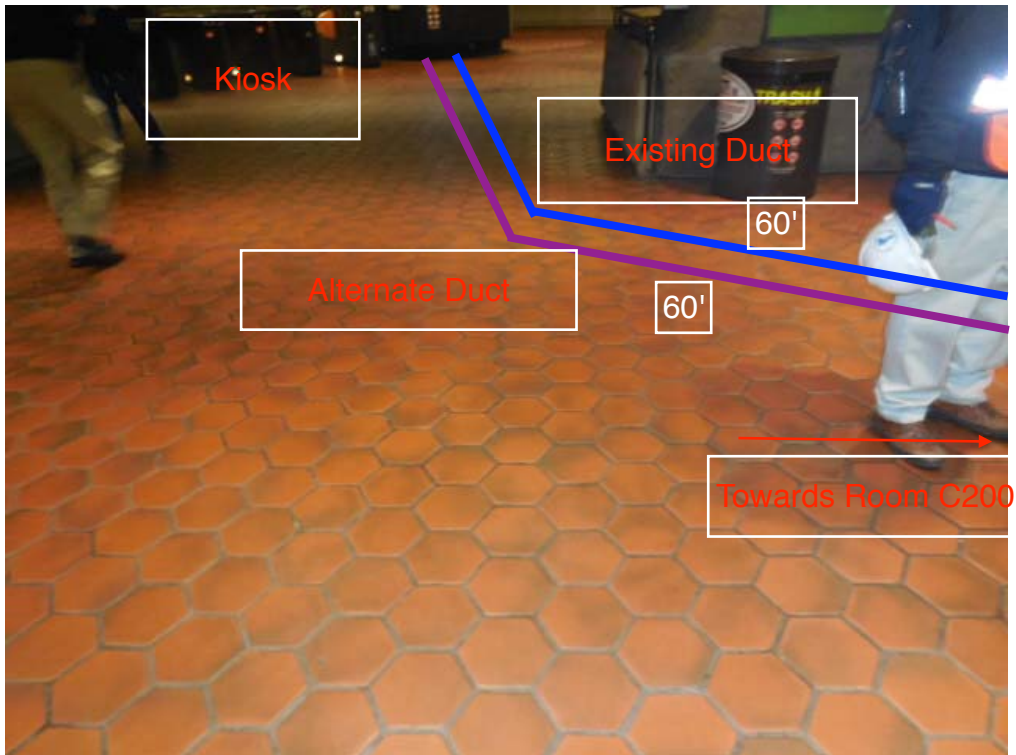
Existing and alternate duct runs on mezzanine floor.
